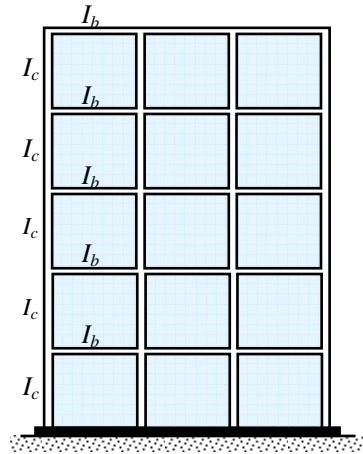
A typical moment frame building with *uniform* size of beams and columns
